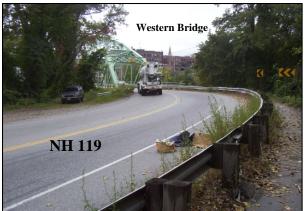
NH 119: View from the mid-channel island west towards the western bridge.
